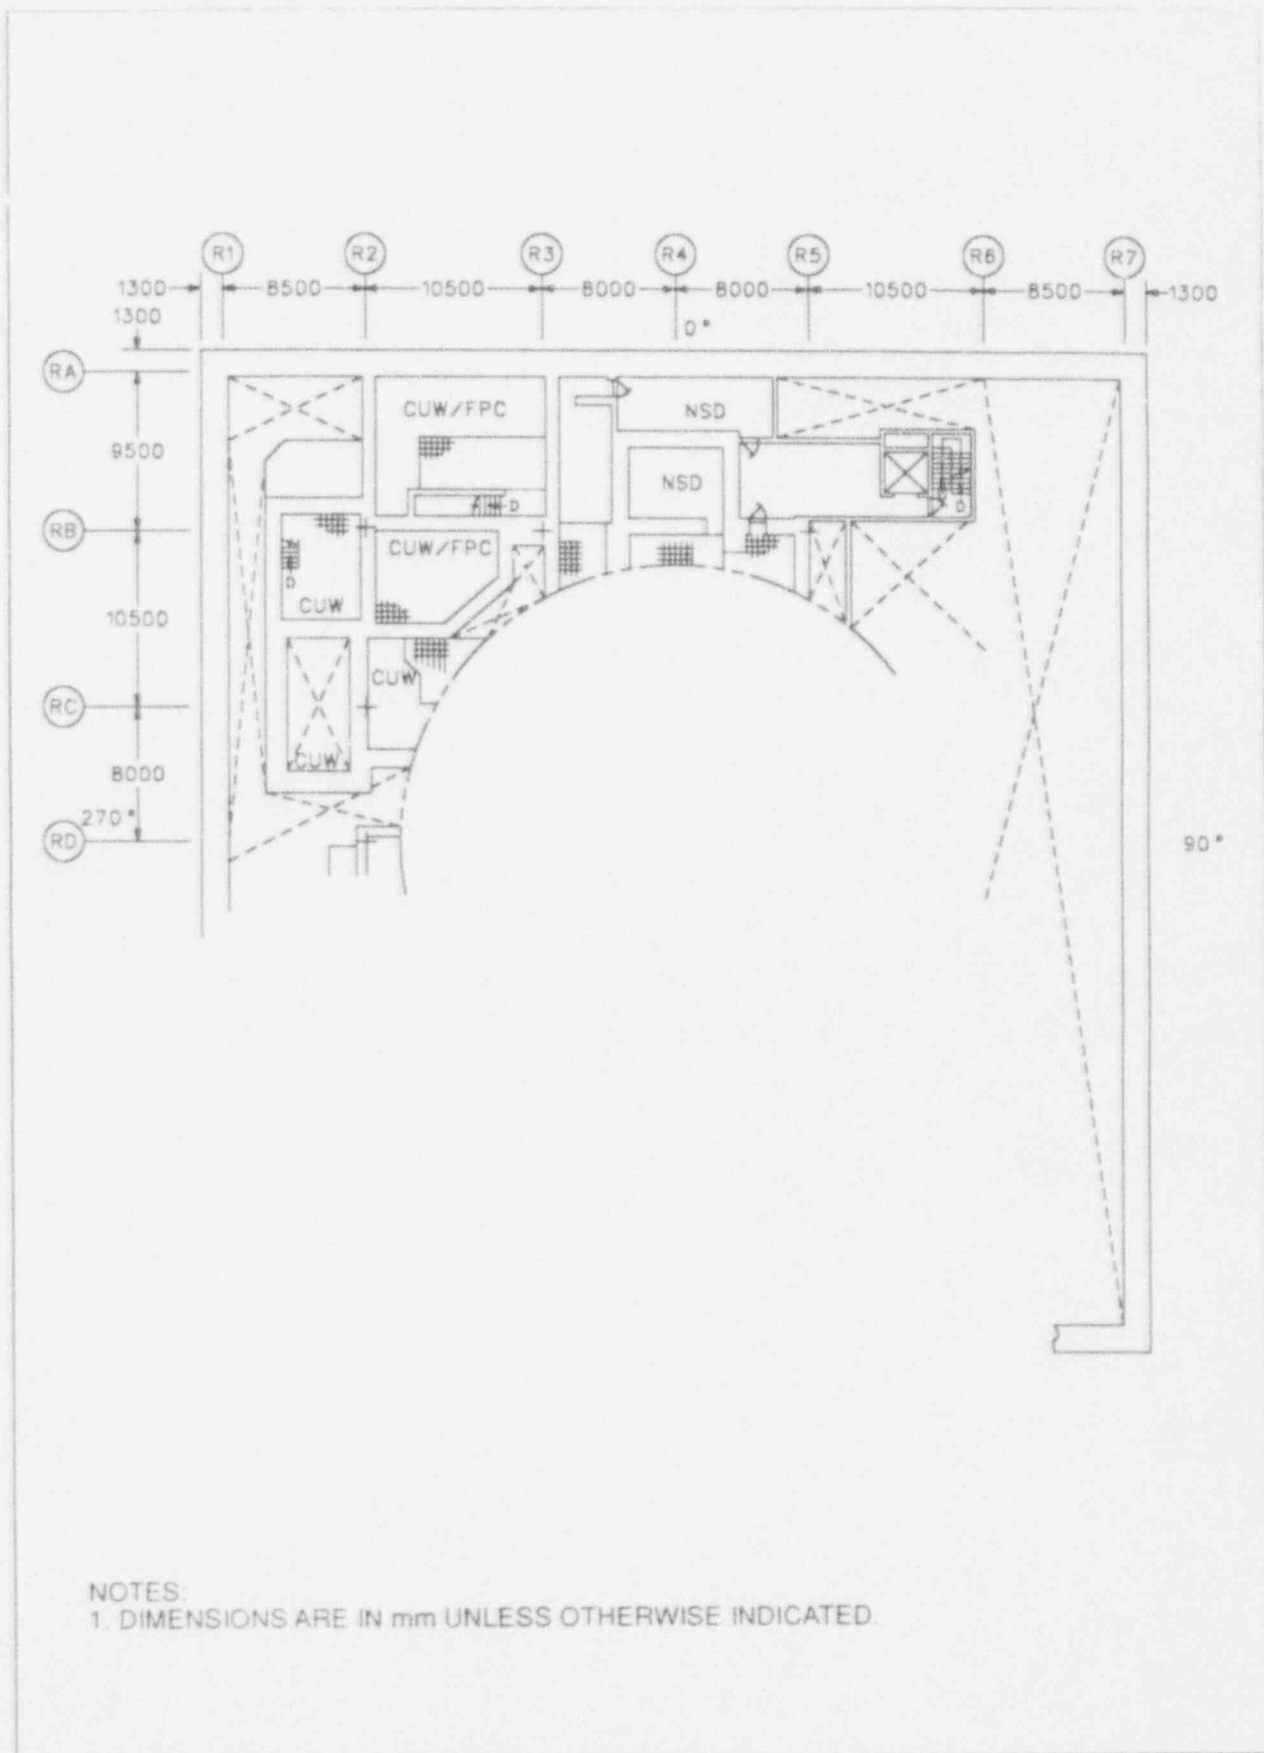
Reactor Building Arrangement BM2F—Elevation 1500 mm
